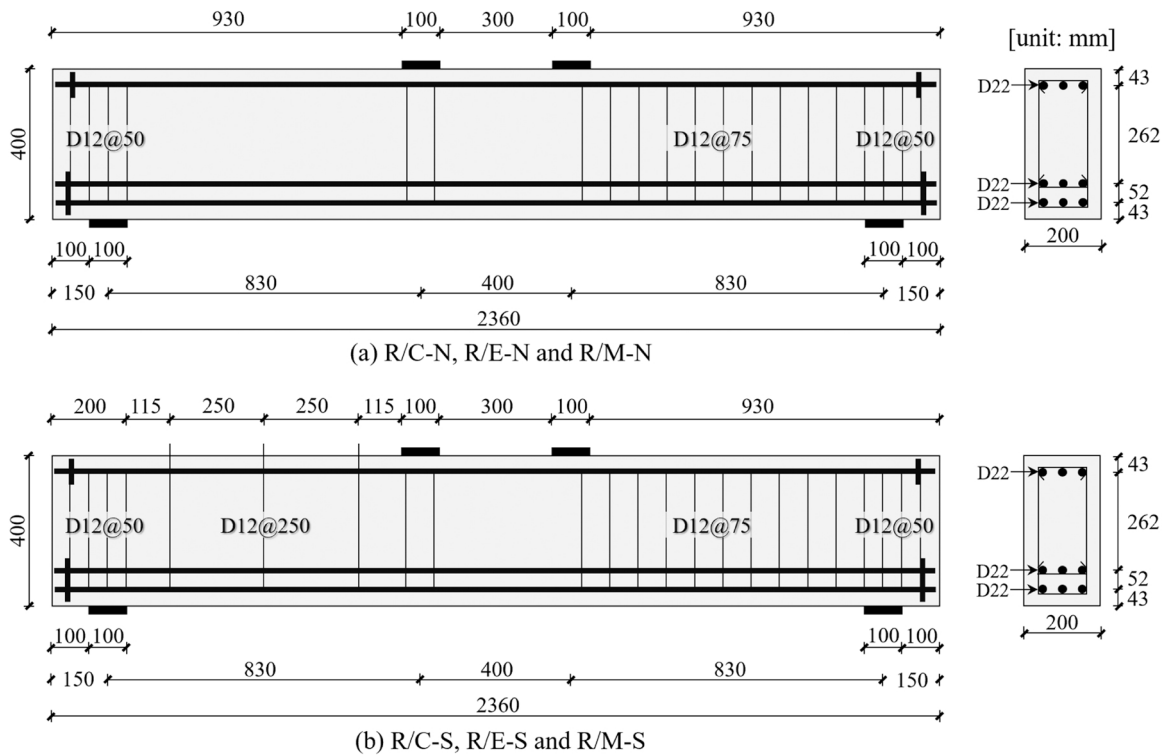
Specimen dimension and reinforcement details for: (a) beams with no stirrups; (b) beams with stirrups.
